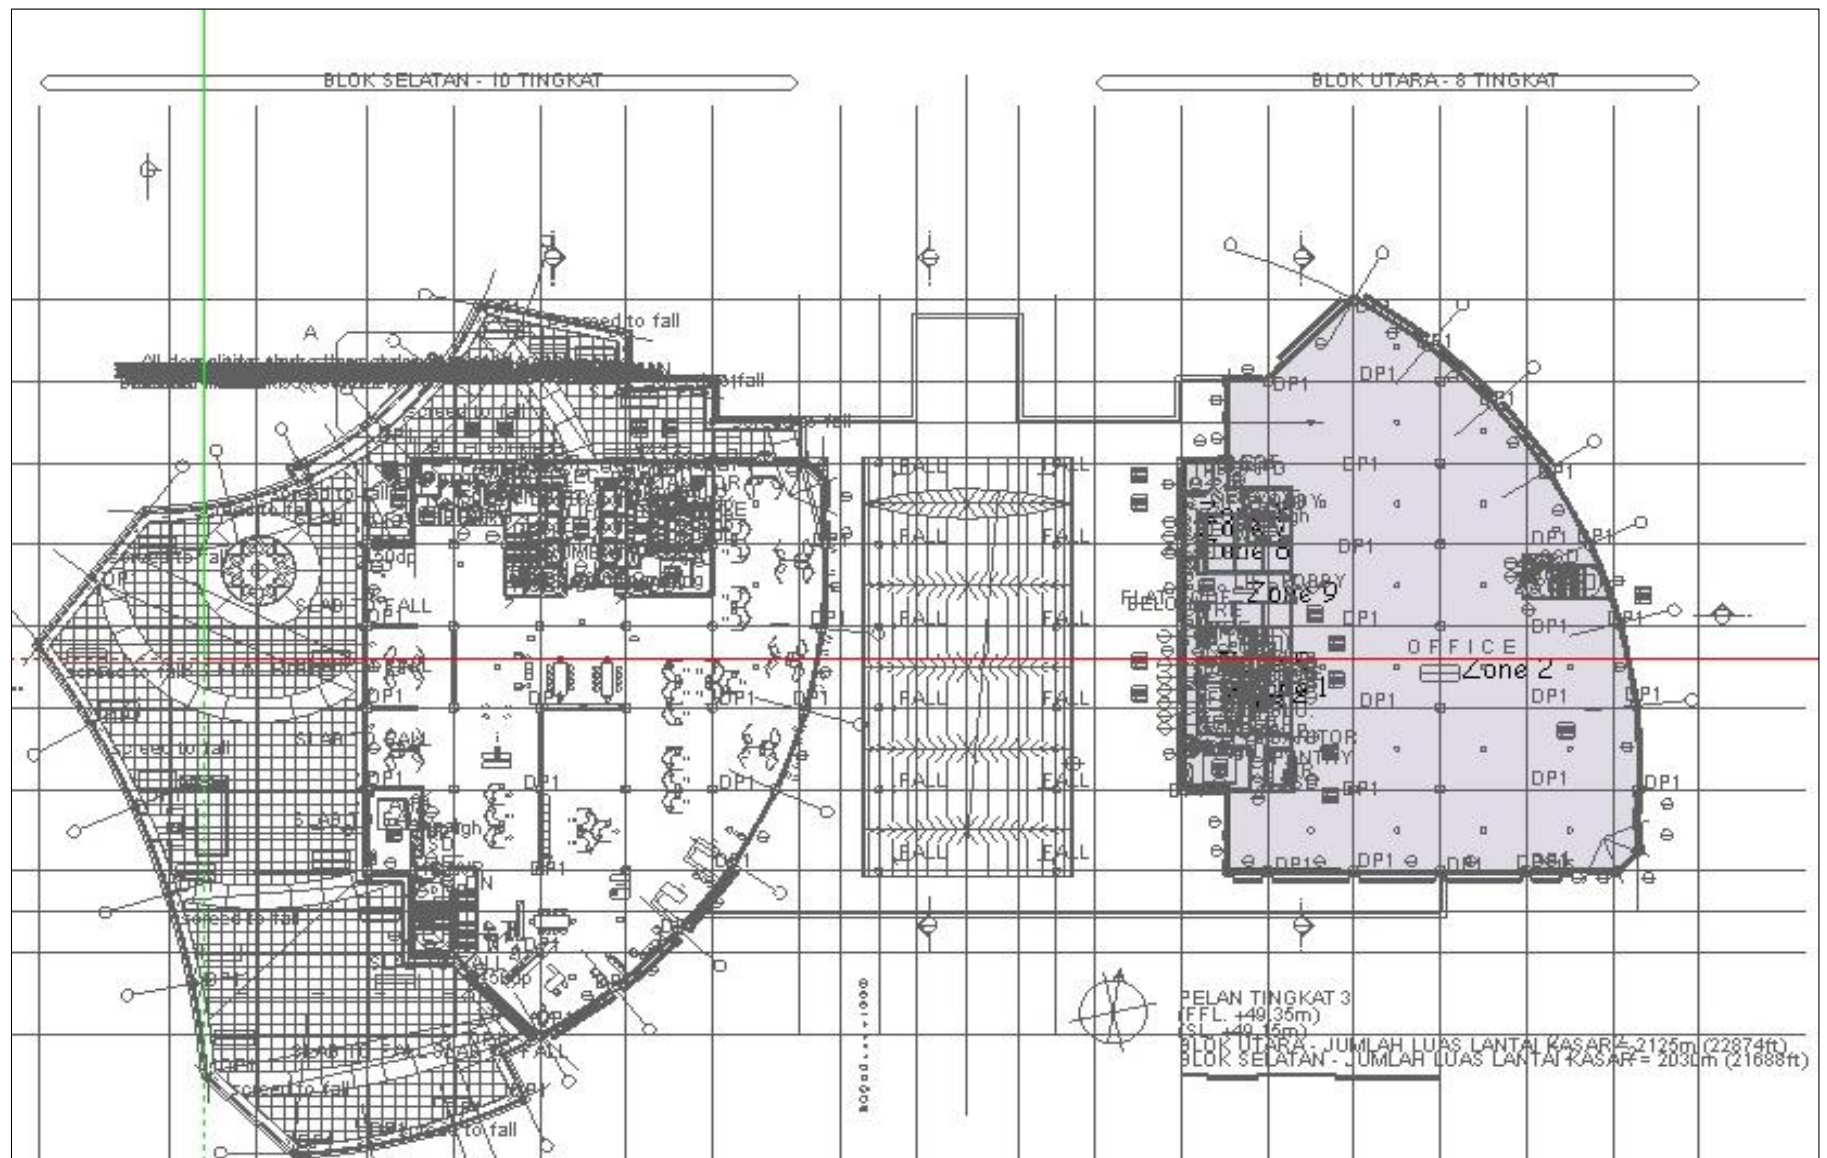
The floor plan of target building's ground floor imported to DXF file in design builder software.
